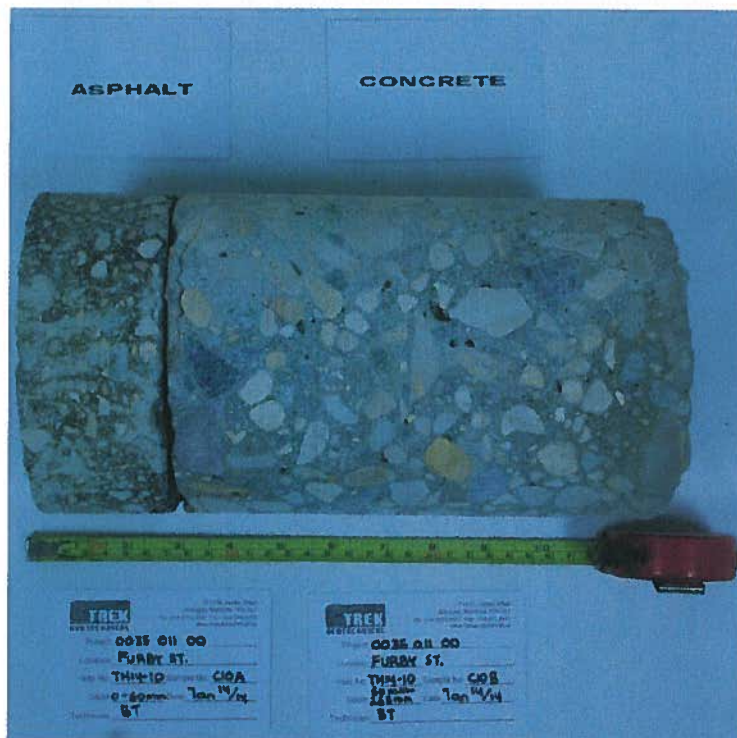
Asphalt and Concrete Core Sample from Test Hole TH14-10
